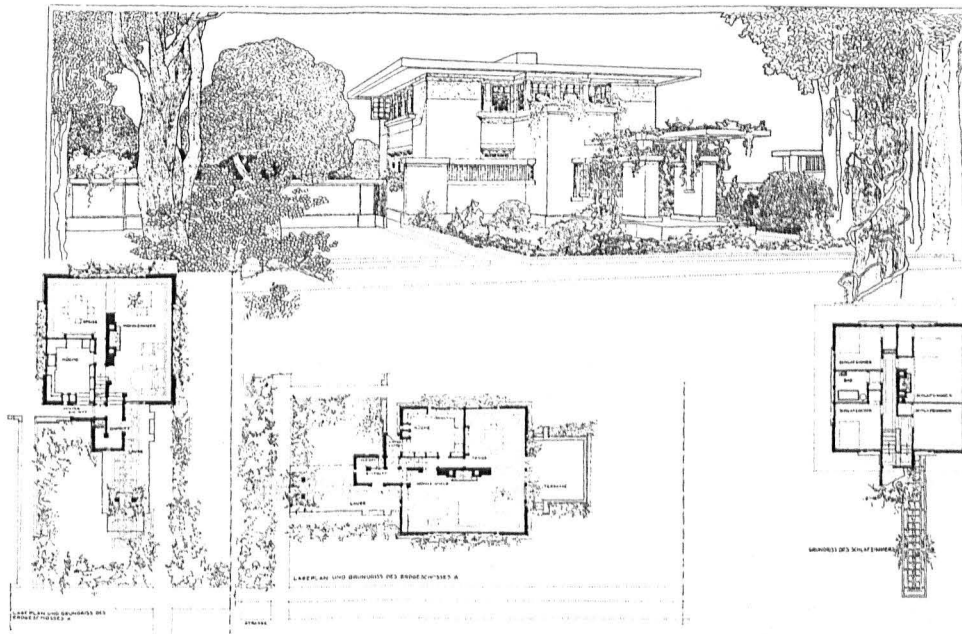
Fireproof house for Ladies Home Journal, 1907. (source: Ausgeführte Bauten)
